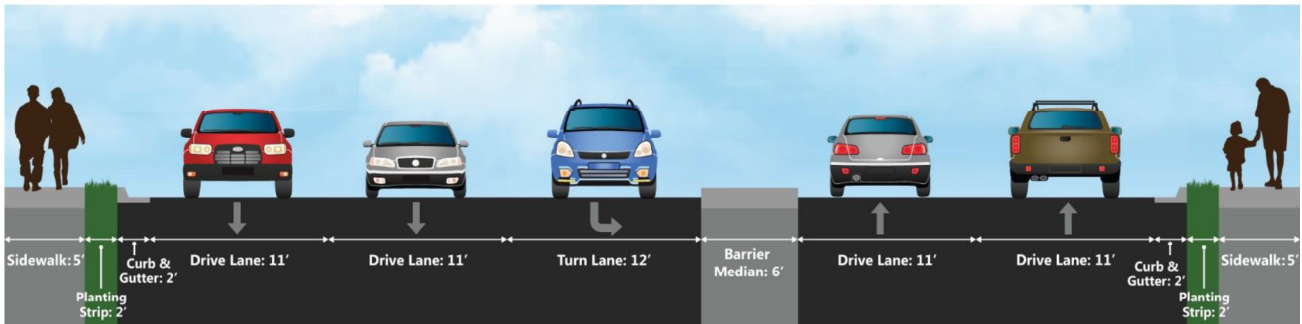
SR 40 from Cassen Park to John Anderson Drive Typical Section (Bridge)
